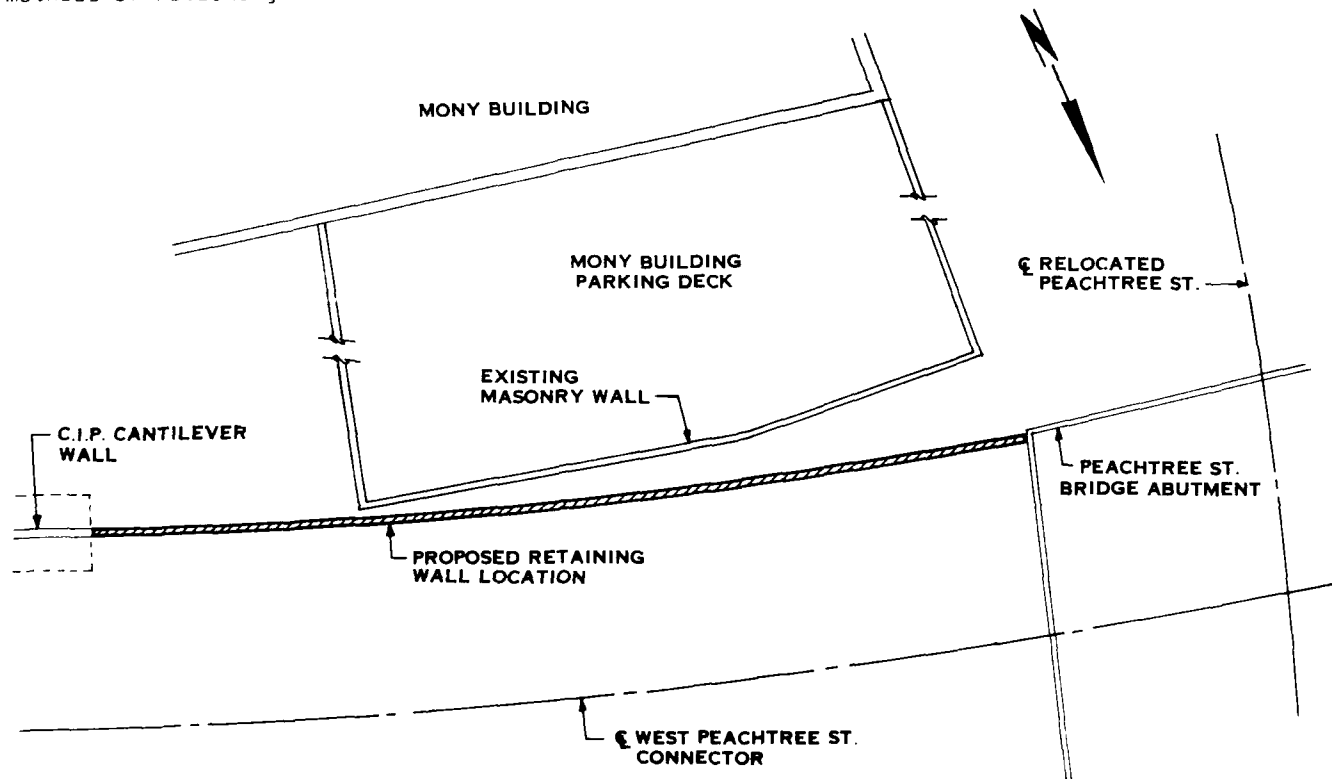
PROPOSED RETAINING WALL LOCATION
